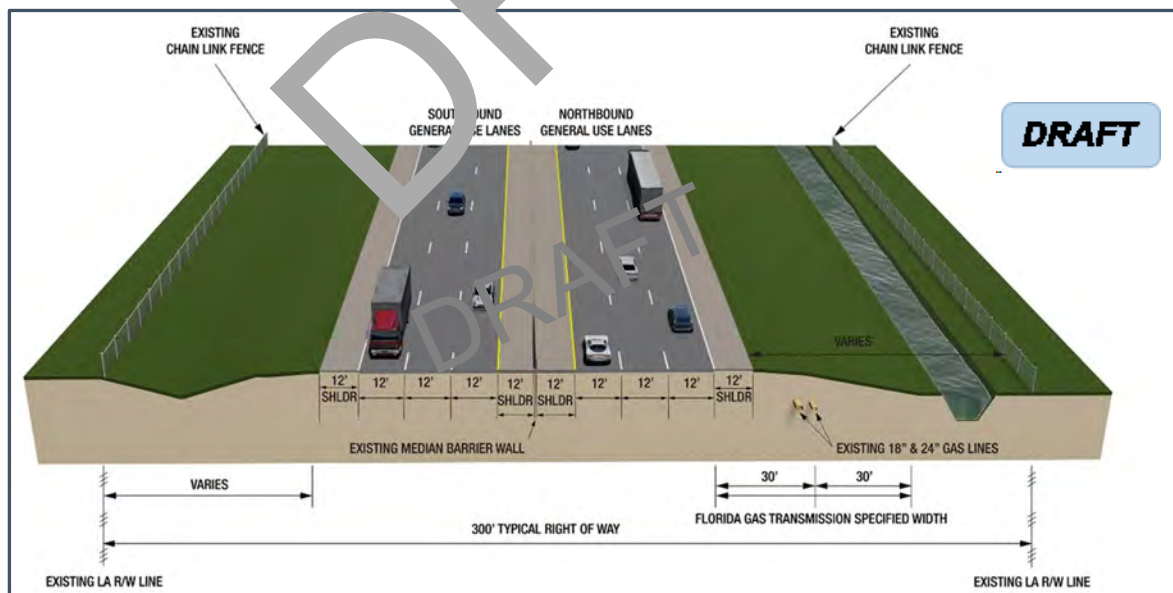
Existing Typical Section (Atlantic Boulevard to Wiles Road)
